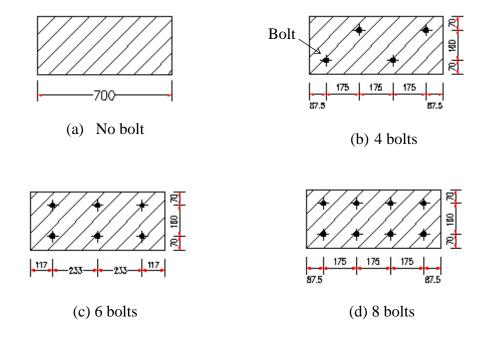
Geometry and reinforcement of RC beams (unit: mm)
